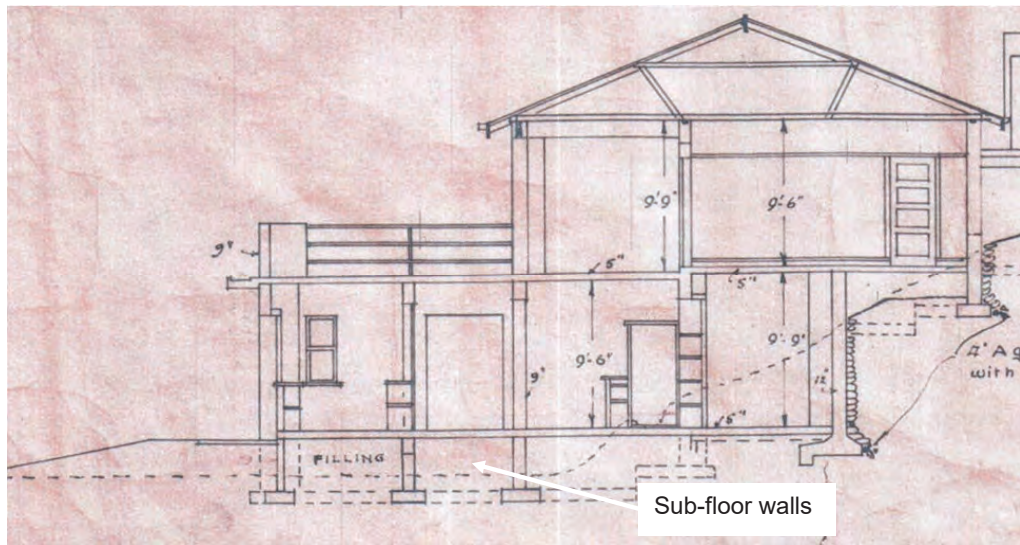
Excerpt from Original blue prints showing section through building – Note sub floor walls and step in suspended slab.
